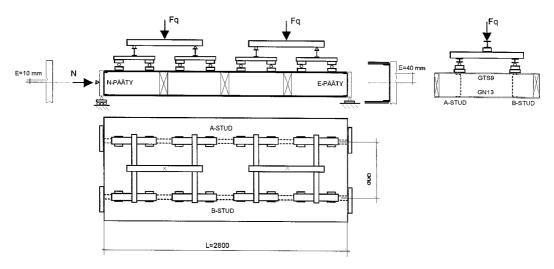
Test arrangement in the acceptance and strength tests for the load bearing framing system. The reference elements were tested with equal loading arrangement with bare distributed load arranged with hydraulic actuators.
